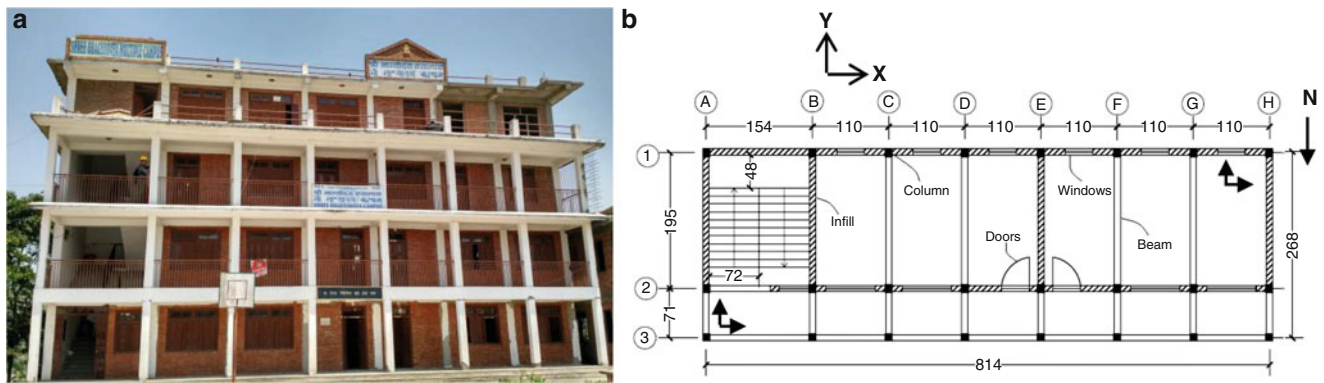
School building in Sankhu. (a) North elevation of the building, (b) Plan view
